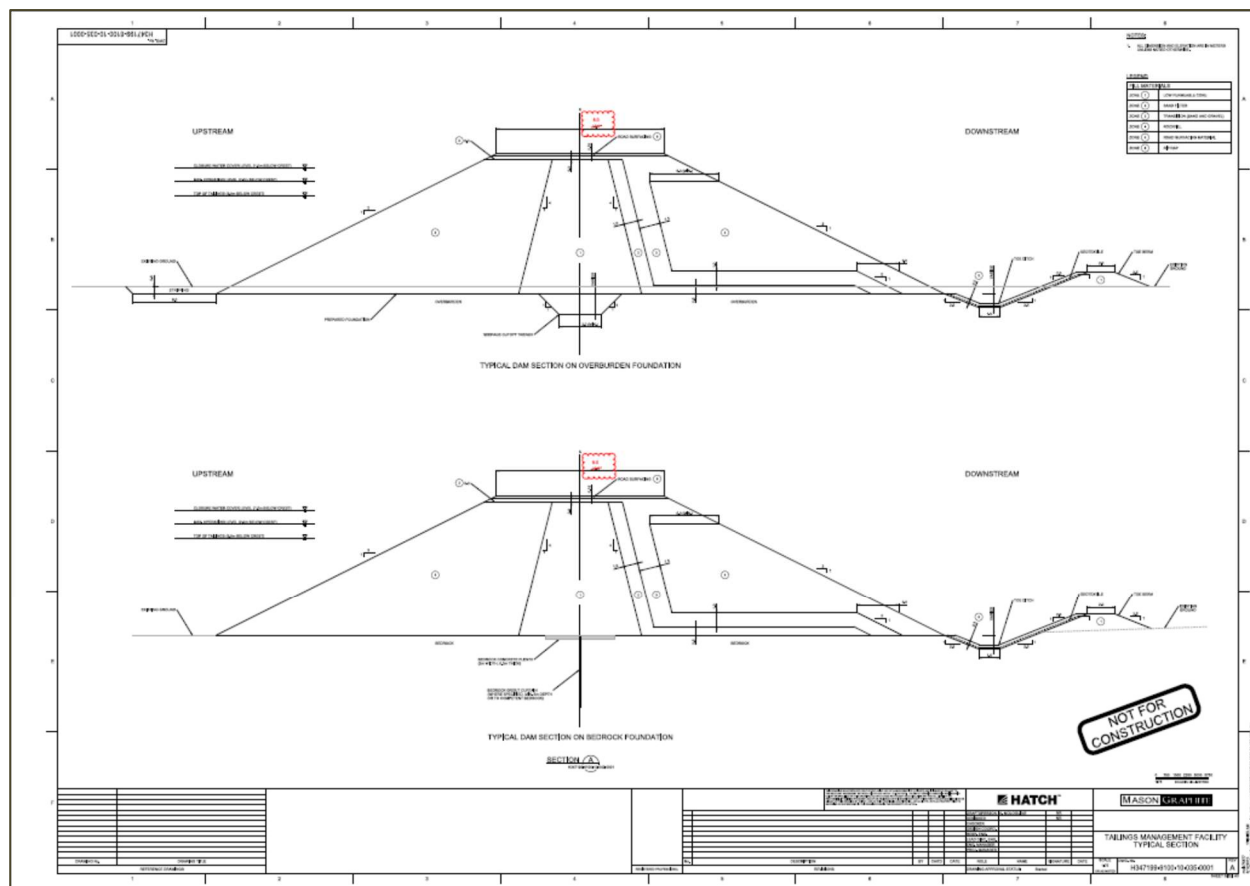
Dam Section Configurations, on Soft and Bedrock Foundations
